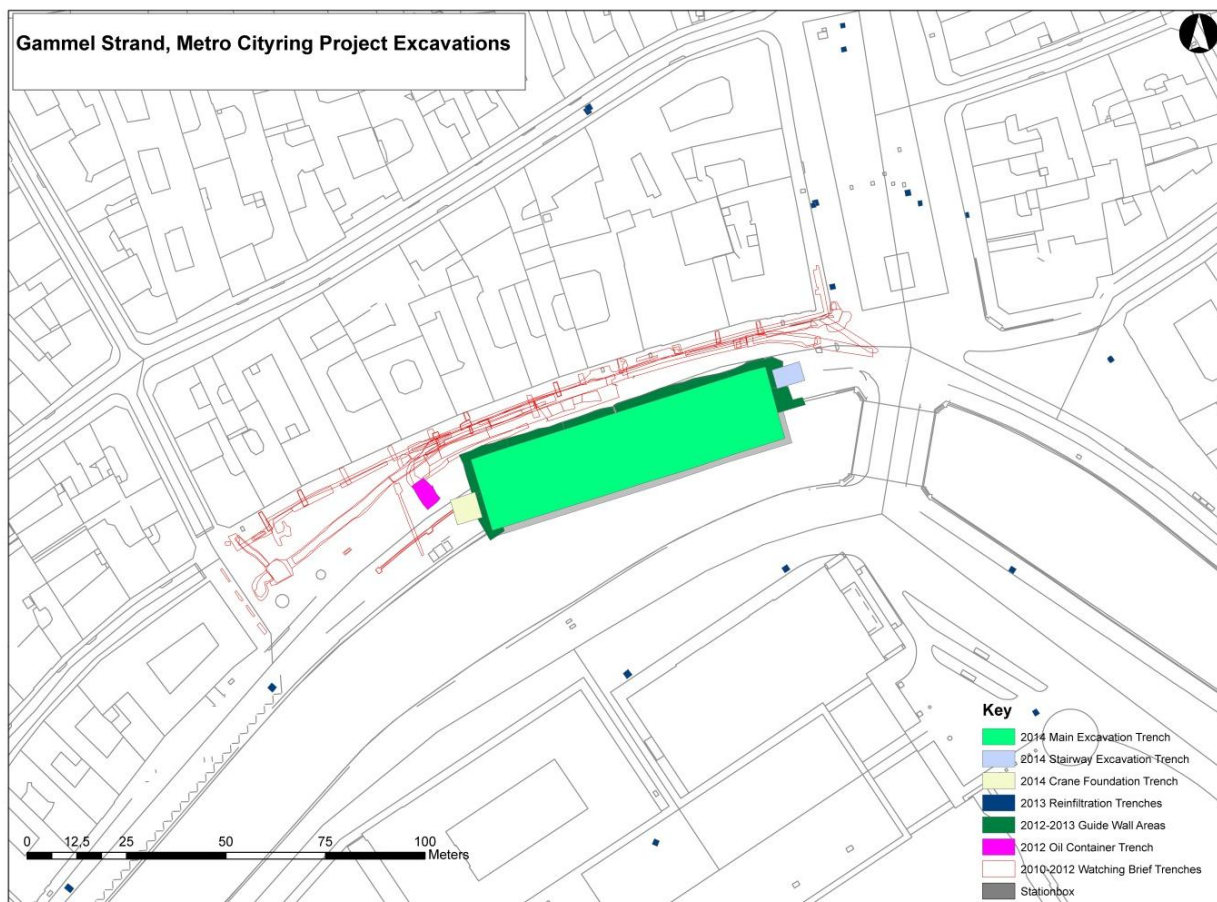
Plan showing the Gammel Strand Metro Cityring excavation trenches, and their dates
